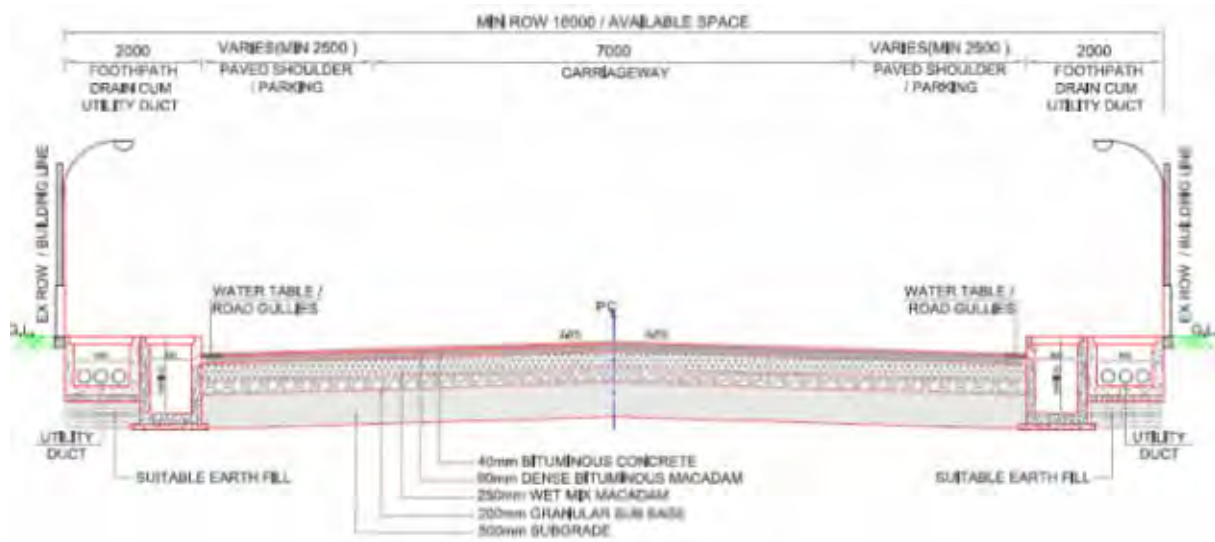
C2-U-R (F): Two Lane Carriageway with Paved Shoulder in Urban Area (Full depth Reconstruction)
